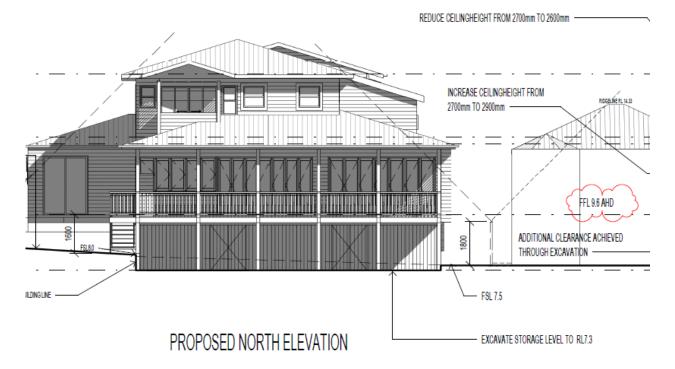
Proposed Northern Elevation as amended It is noted the eaves and gutters are set just above the neighbours to the west.
